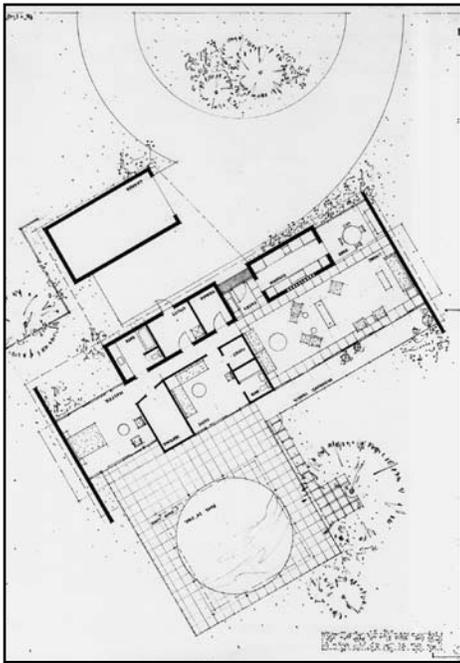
Jaffe-Garrett House plan (built 1959)
